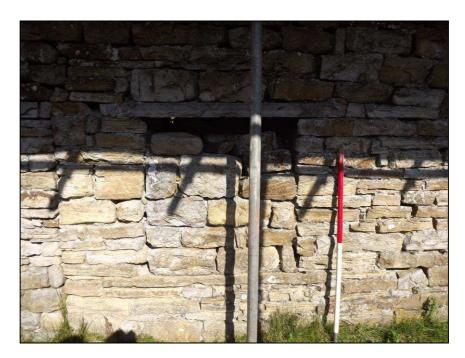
One of the two blocked windows in the south elevation of Bentyfield Mine Shop (Scale = 1m)
